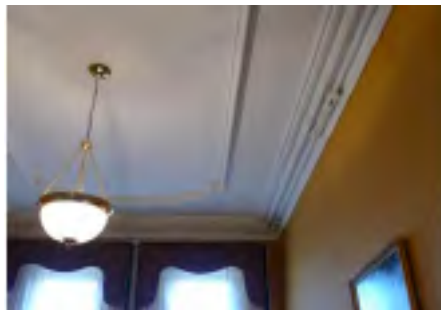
Decorative plaster ceiling in South Center Hall BR 301a
